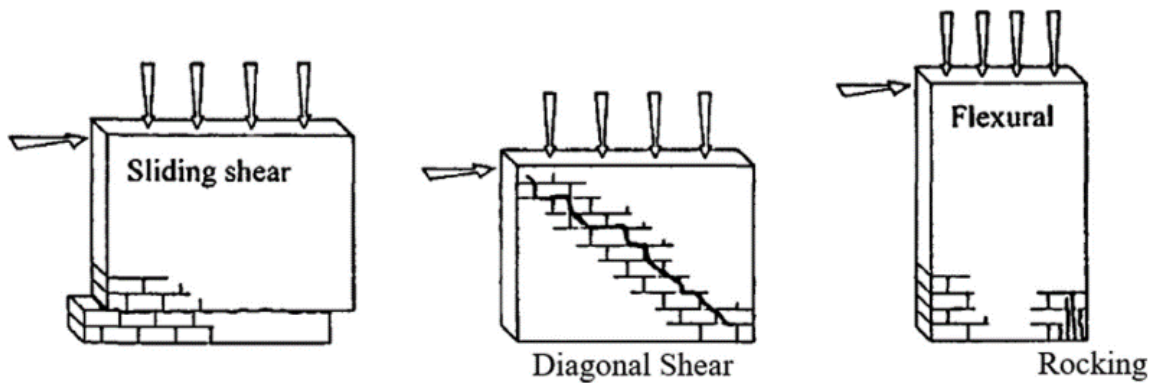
Typical failure modes of unreinforced masonry piers subjected to horizontal in-plane loading (from left to right): - Shear failure mechanism with sliding along bed joint; - Shear failure mechanism due to diagonal cracking; - Flexural failure mechanism due to rocking and toe crushing (Tomažević, 1999).
